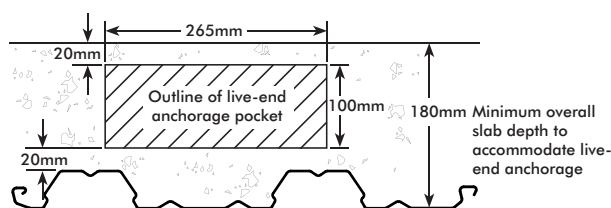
D Fitting a Typical Live-End Anchorage in a Composite Slab Incorporating KF40®
